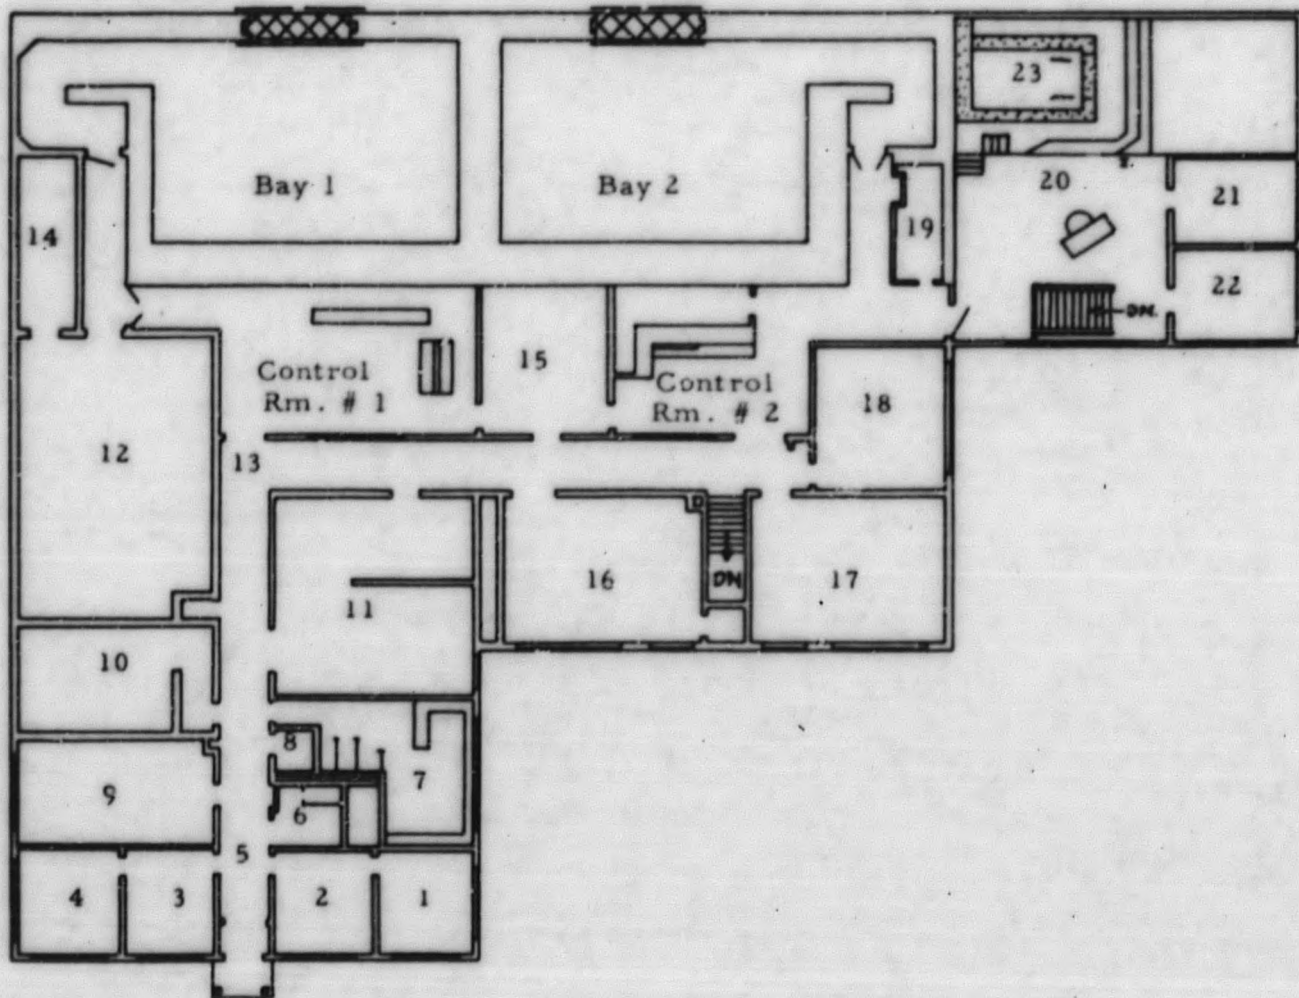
CRITICAL EXPERIMENT LABORATORY - BASEMENT FLOOR PLAN
